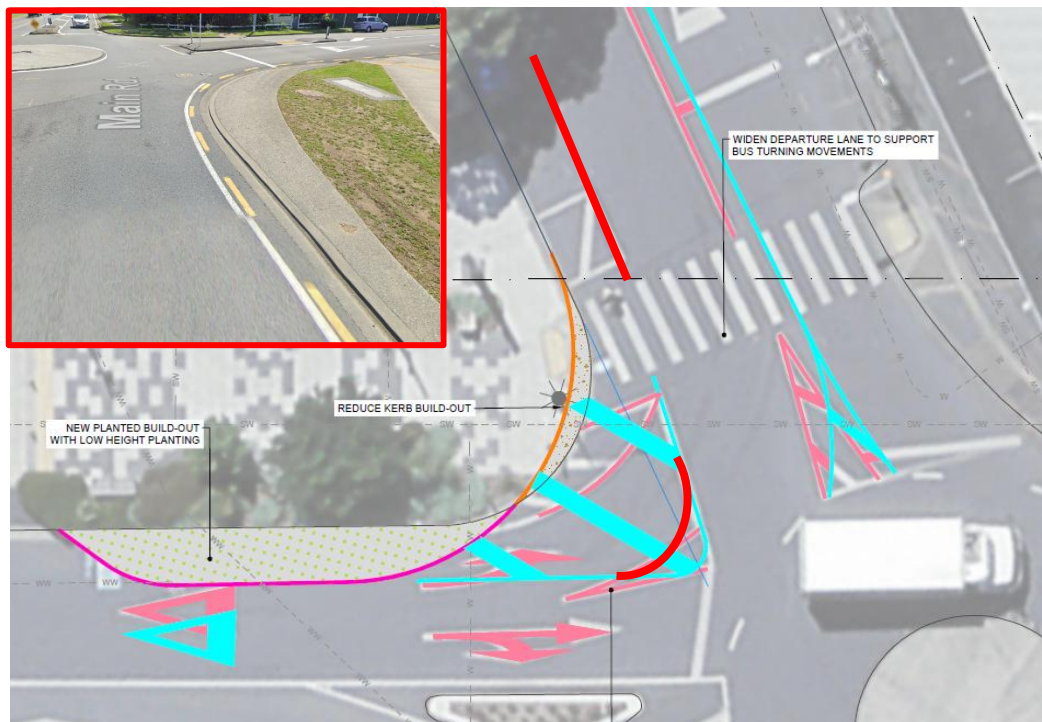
Proposed road markings / intersection adjustments at Miramar Avenue / Park Road.
